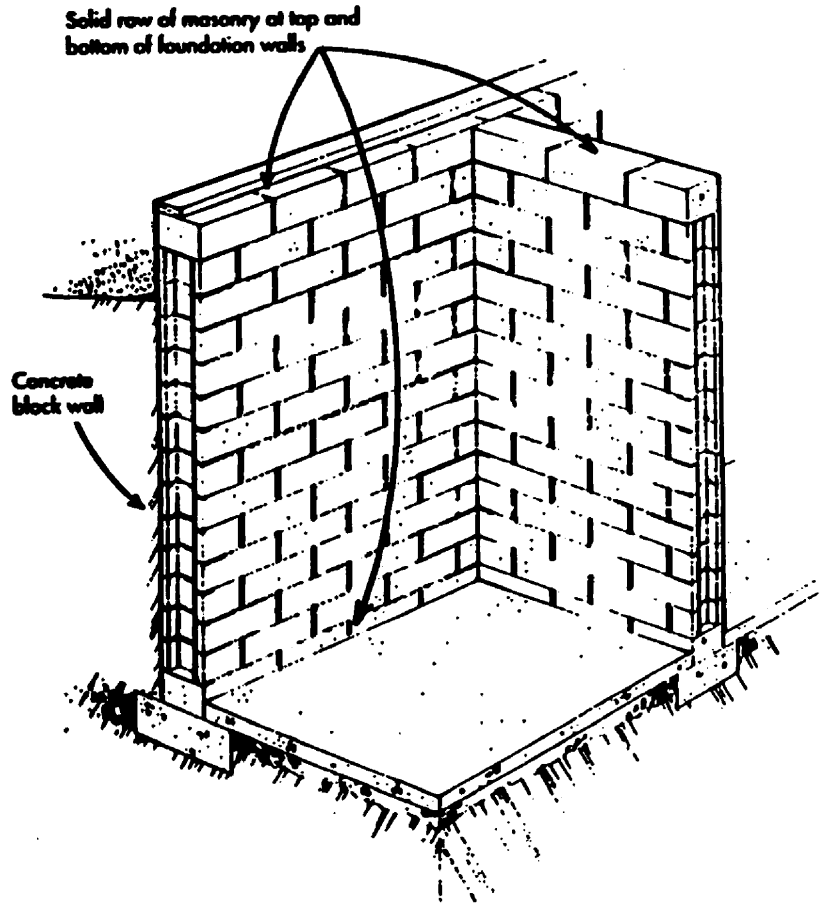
Eliminating voids at the top and bottom of new concrete block foundation walls
